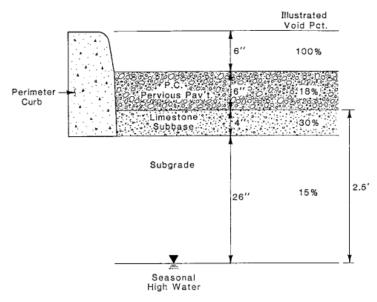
Standard Detailed Drawing of Pervious Concrete Sidewalk (ACI, 2011)
